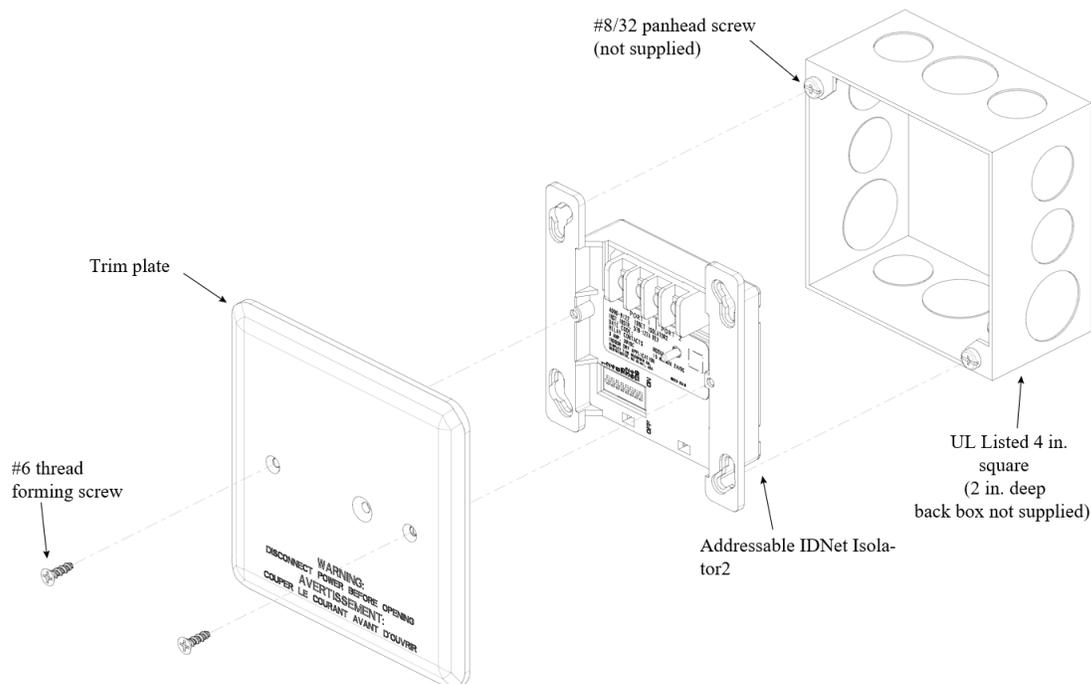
4 in. box mounting with 4090-9814 trim plate
